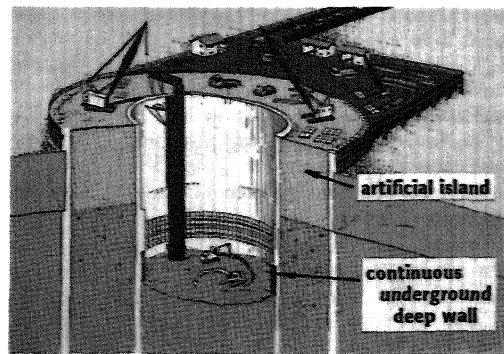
Cross-sectional view of the continuous wall underconstruction.
